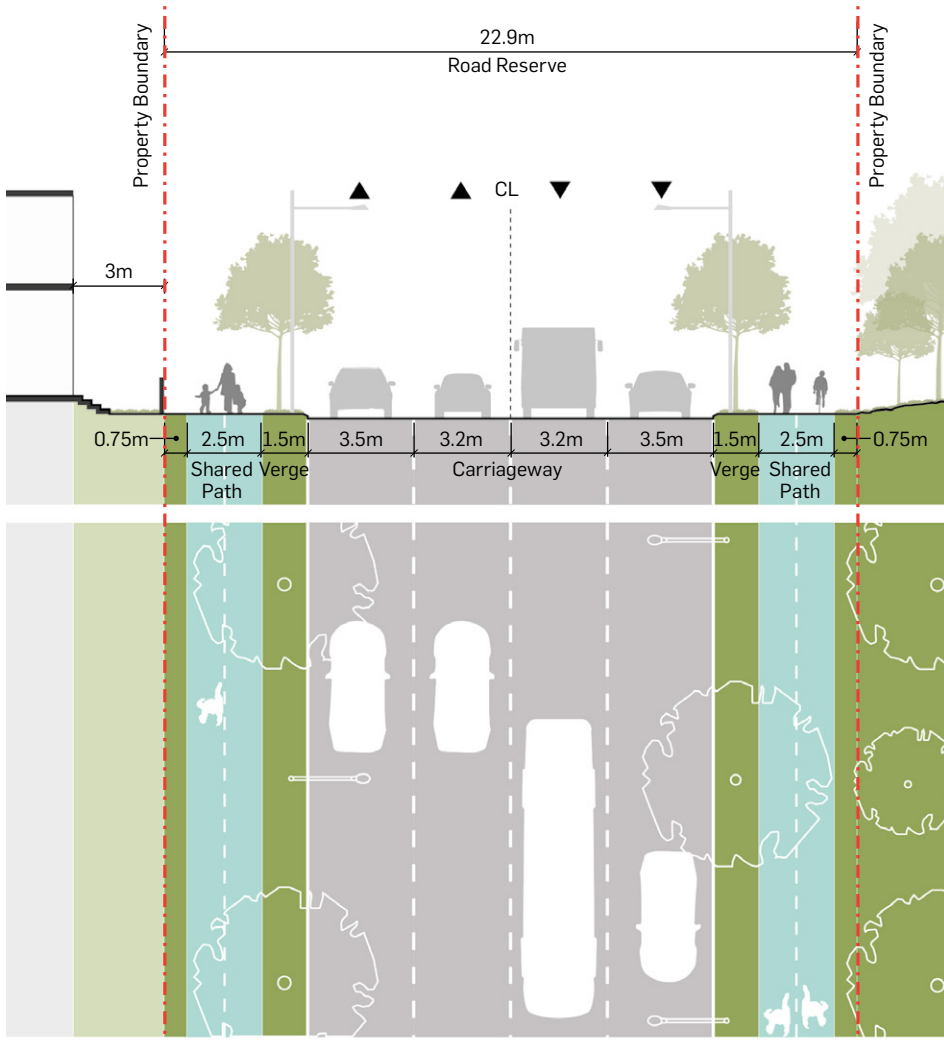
Indicative Street Section A-A' - Sub-Arterial Road - Type 2
